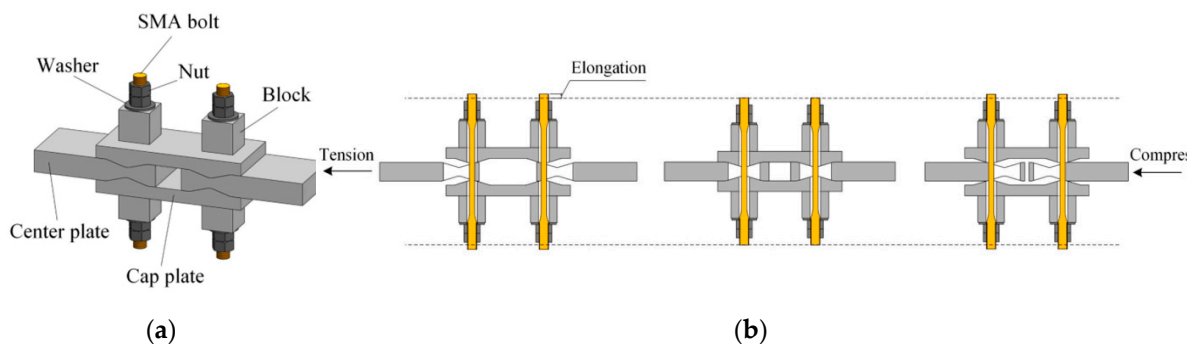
SMA slip friction damper[79]: (a) Configuration; (b) Sliding mechanism under axial loading reversals.
